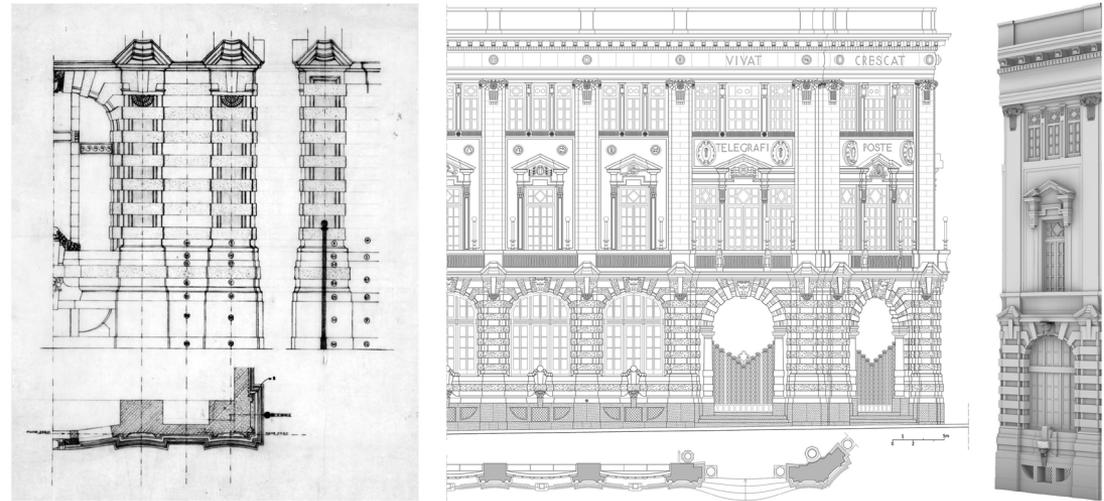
Palazzo delle Poste: project drawing of the corner detail (on the left), main façade elevation and 3D model of a façade span (on the right) (2D restitution and 3D model by Biondi R., Cucuzza D., Cutrufo R., Lauria L., Musumarra S., Quaceci N., Ruggieri F., Saitta C., Zammataro C.)
